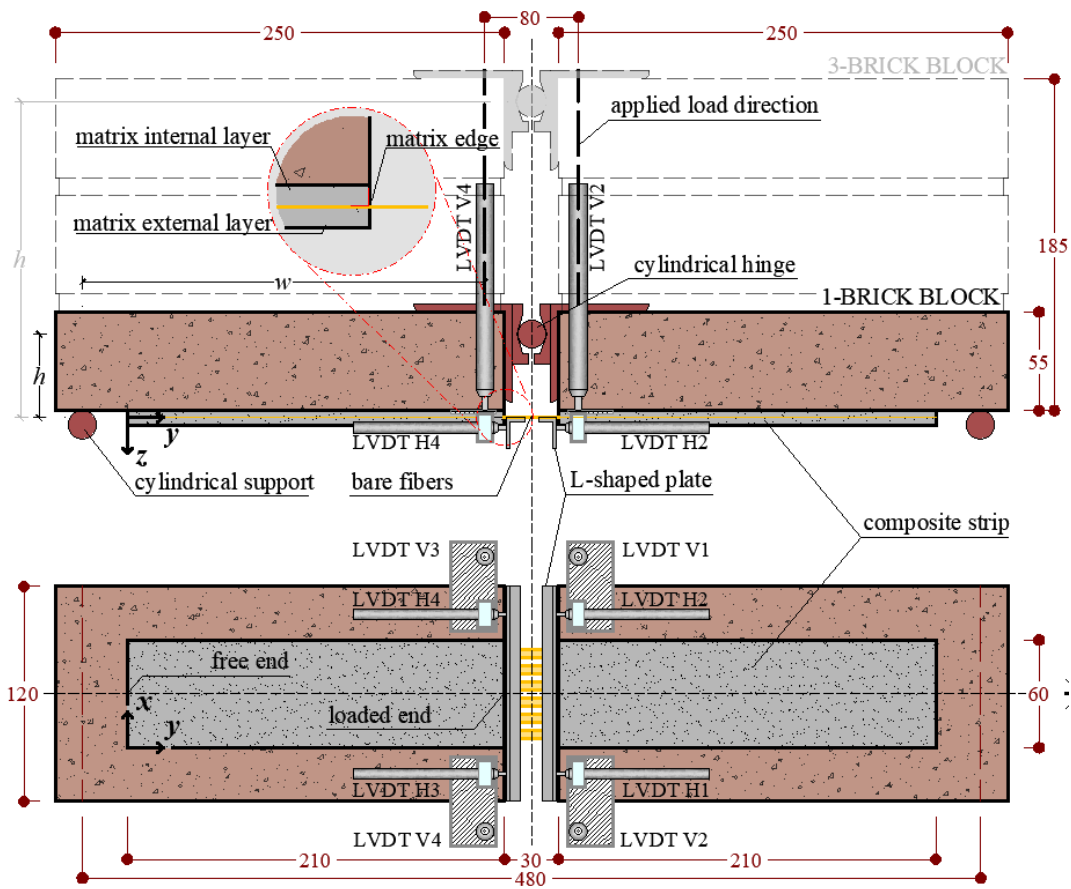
Modified beam test set-up with bare fibers at the gap: a) side view and b) bottom view (dimensions in mm).
